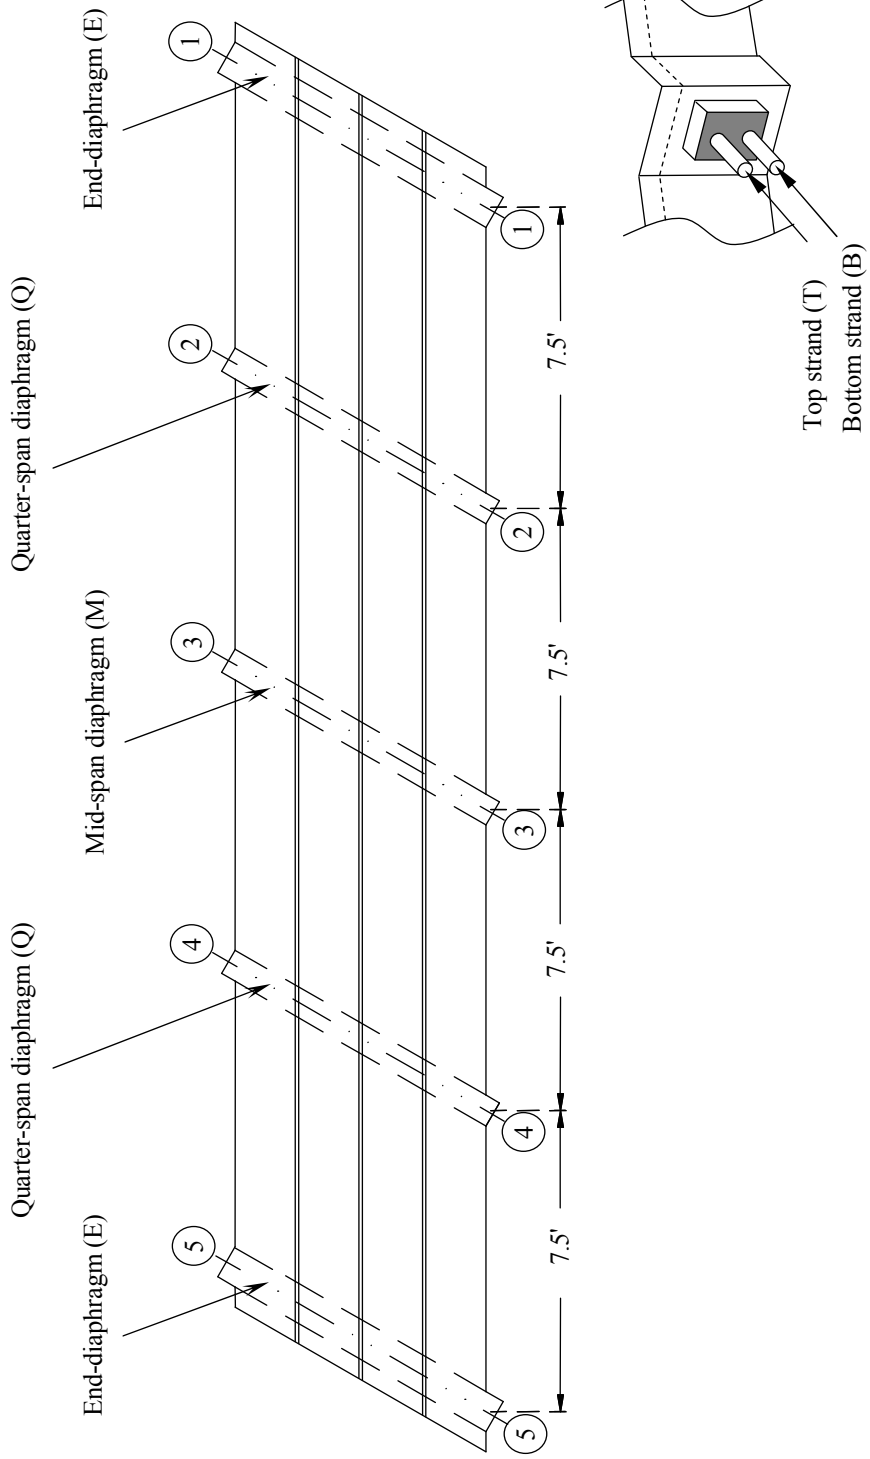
Layout of transverse diaphragms and CFCC.
